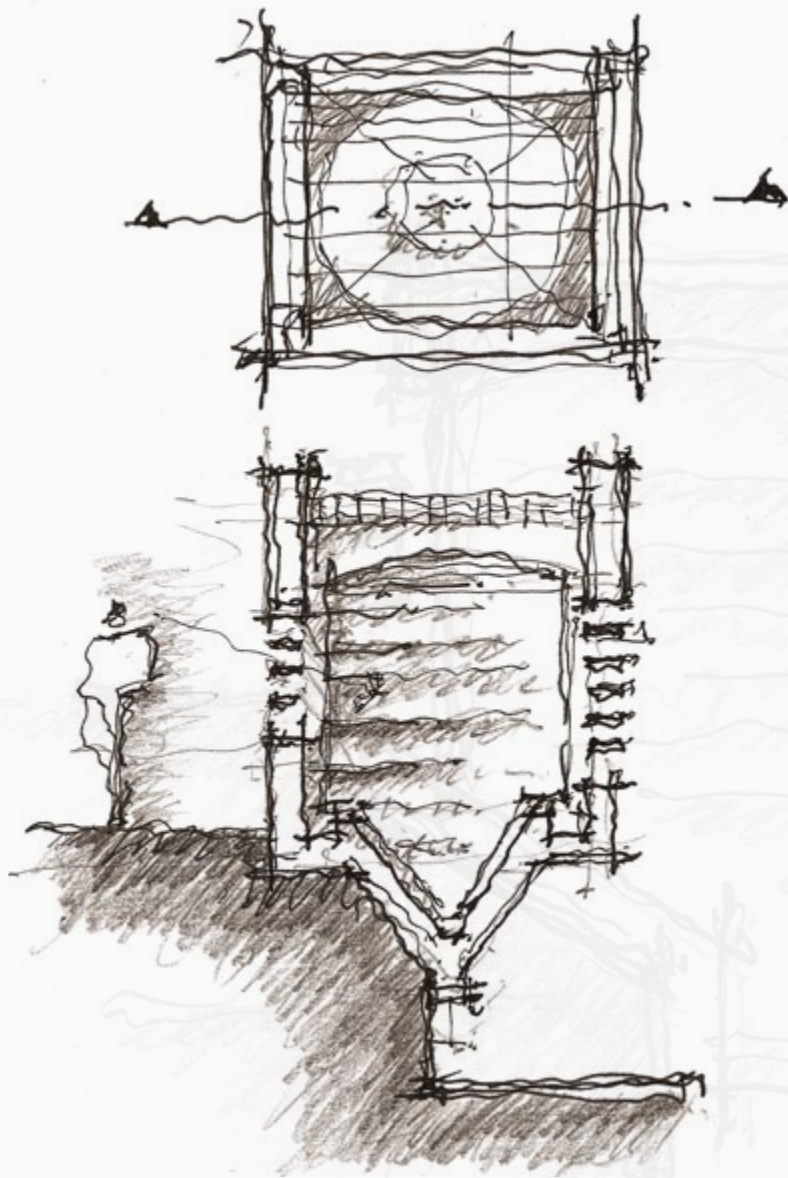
Sketch detail of the milk storage tanks housed within a concrete frame (Author: 2012)
